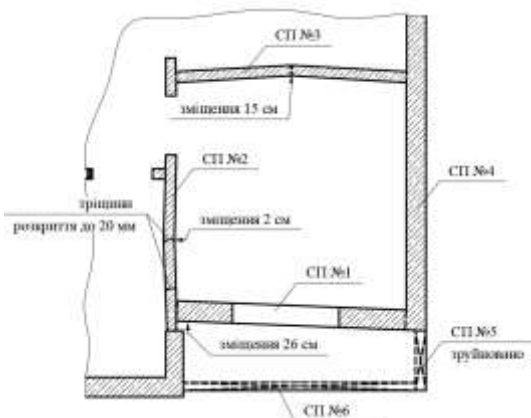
Plan of the damaged room, Apartment No. 40, 10th floor
